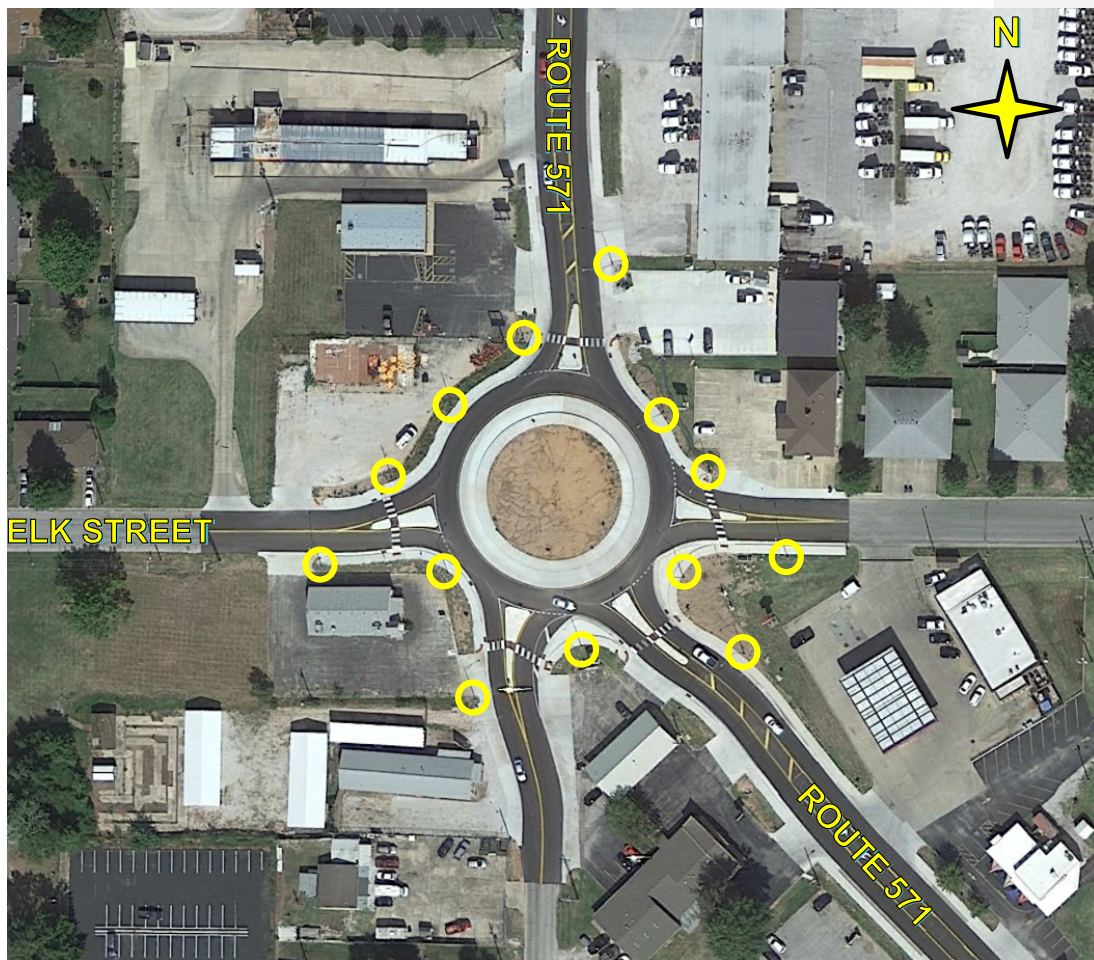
Exhibit D: Showing locations of existing MoDOT owned luminaires at Route 571 and Elk Street.
